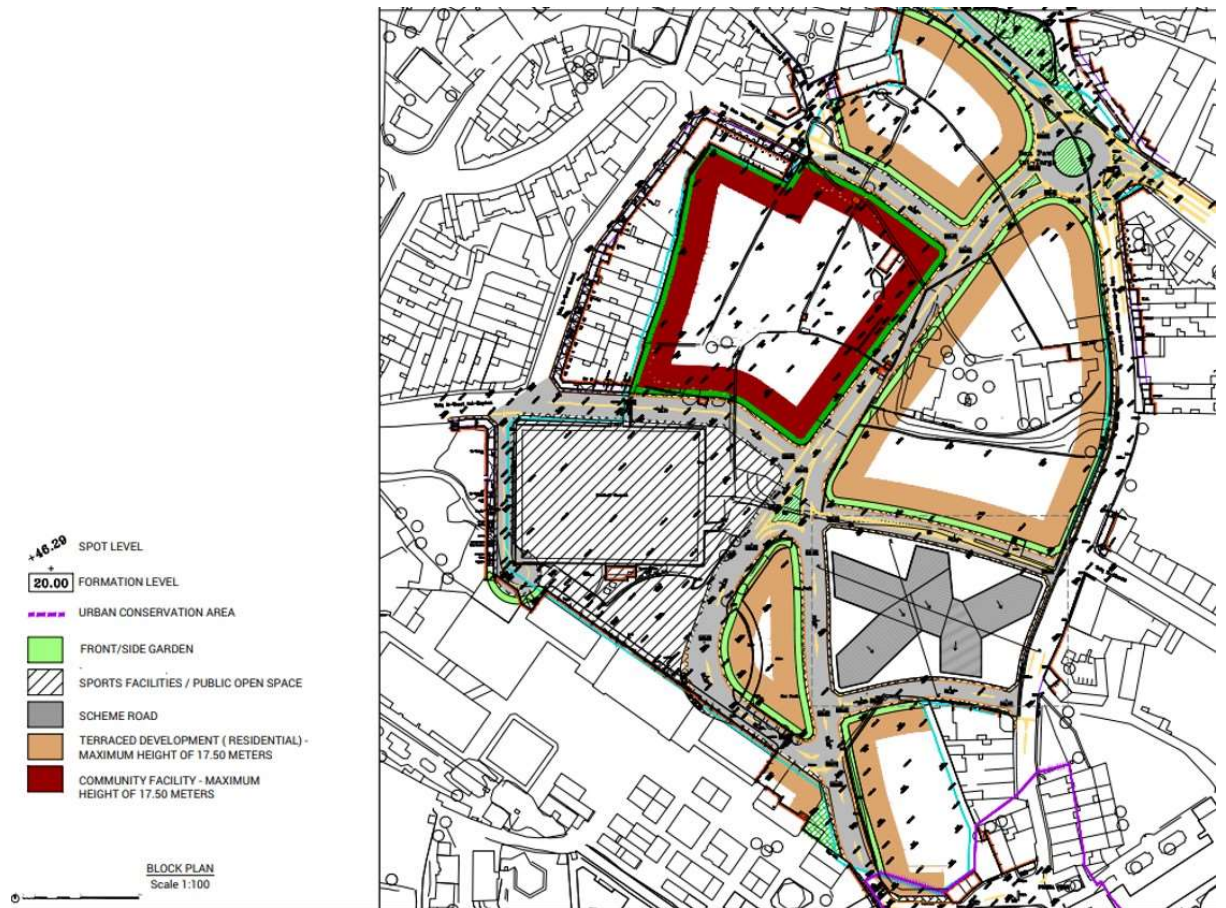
Block Plan (Source: E-apps Document PA/09524/18/17C)
